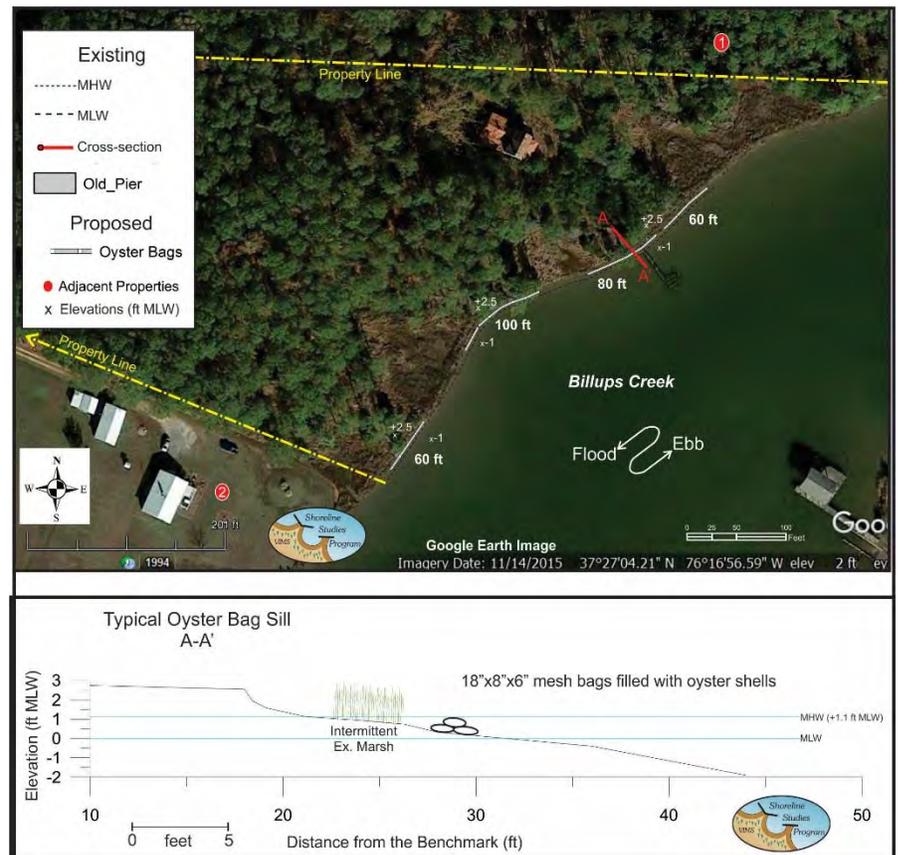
Planform and typical cross-section for the oyster bag sill project at Heritage Park.
